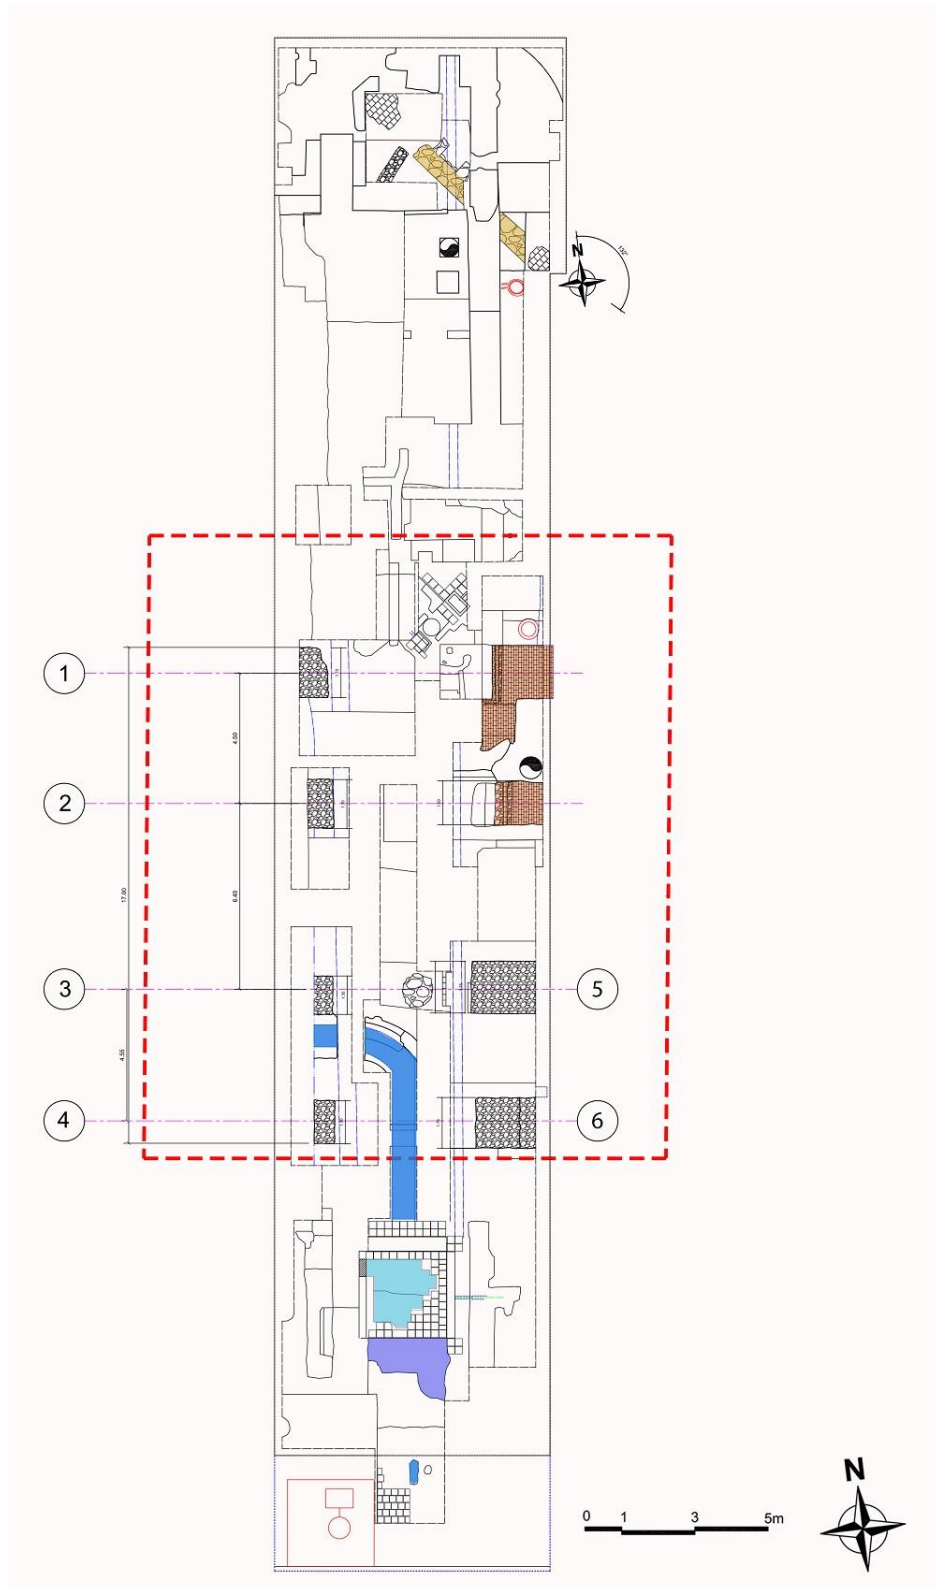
Redrawing of the Jahan Nama palace excavation plan; yellow colour shows the diagonal wall, brown colour shows the two different foundations of the palace which are possibly attributed to the Buyid dynasty, dark blue shows the central water channel in Chahar Bagh, light blue shows the palace's front pool, and purple shows the cascade in front of the palace (After Abdolmohammad 2014)
